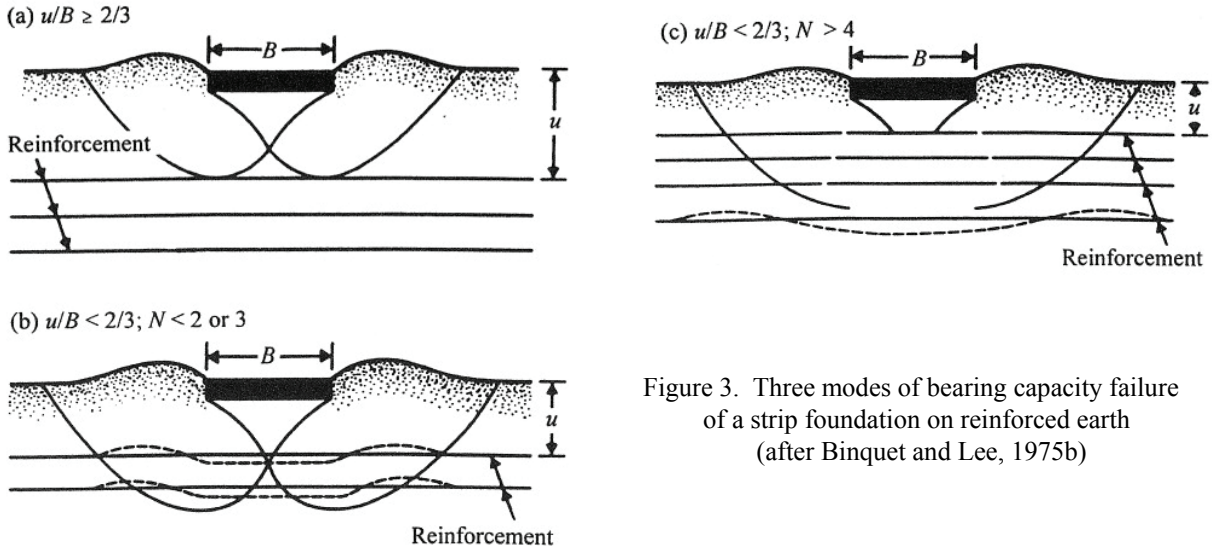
Three modes of bearing capacity failure of a strip foundation on reinforced earth (after Binquet and Lee, 1975b)
